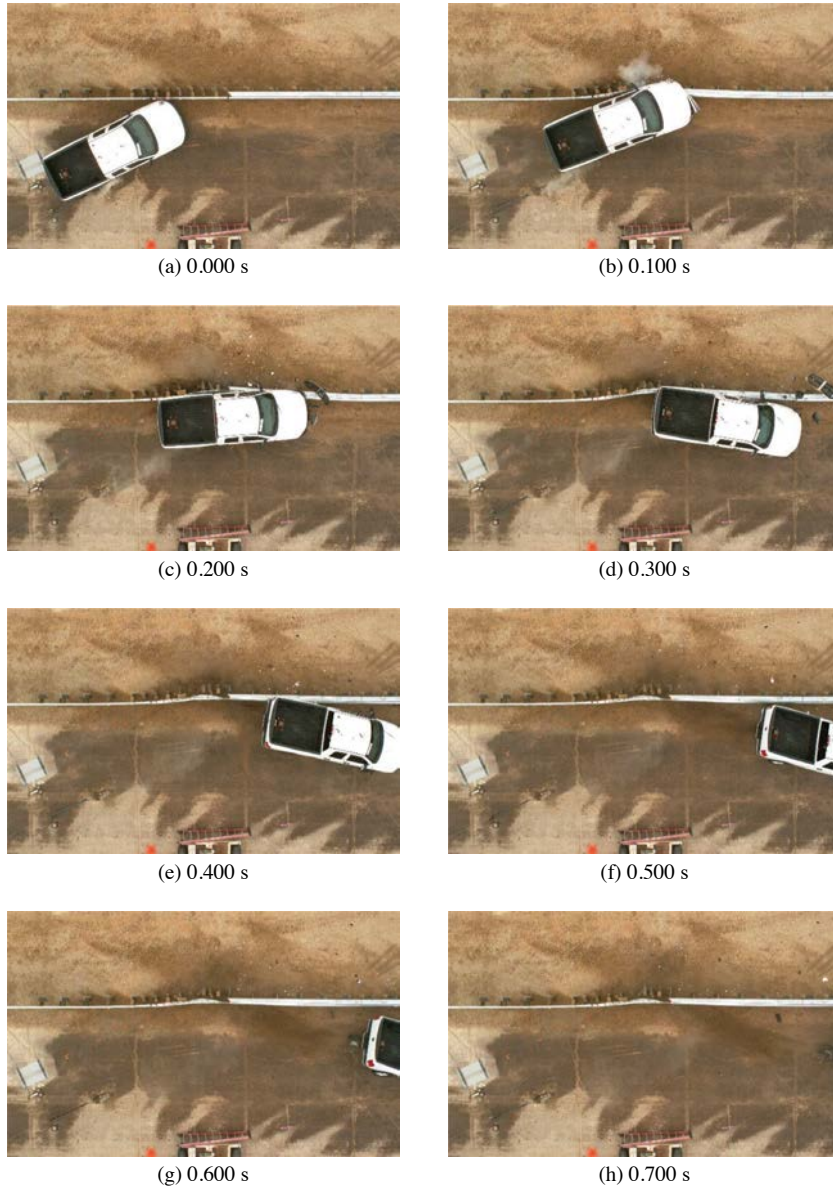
Sequential photographs for test 612941-02-3 (overhead views).
